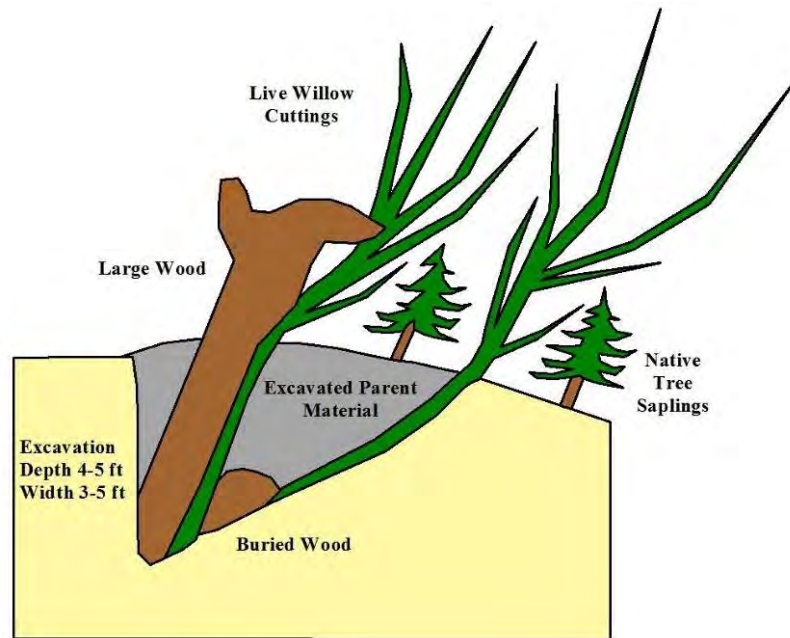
Cross section view of a typical planting island constructed in lower Terwer Creek.
